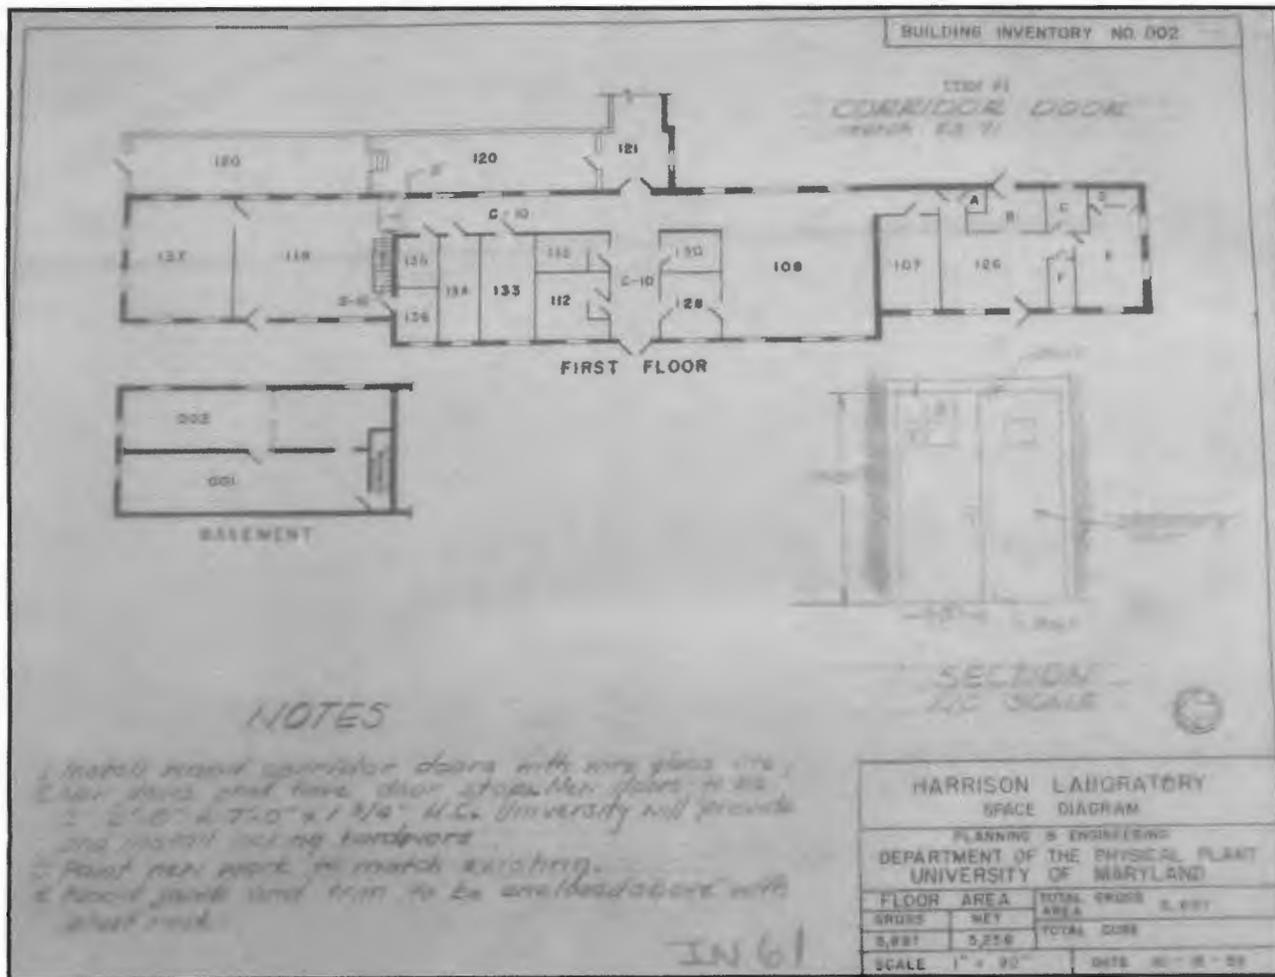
1959 plan showing Harrison Laboratory's internal arrangement. (University of Maryland facility archives.) The current configuration is very similar to that shown here.
